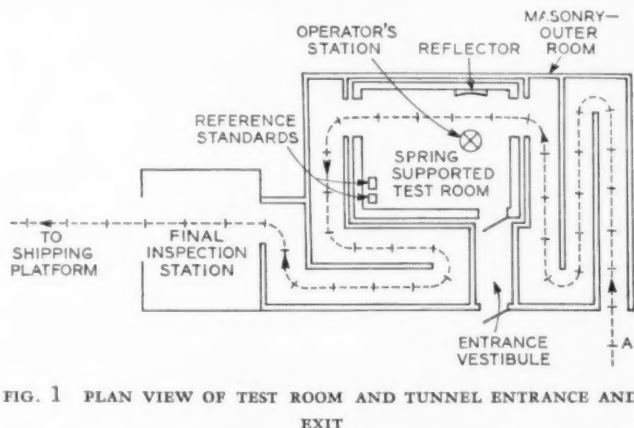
PLAN VIEW OF TEST ROOM AND TUNNEL ENTRANCE AND EXIT
